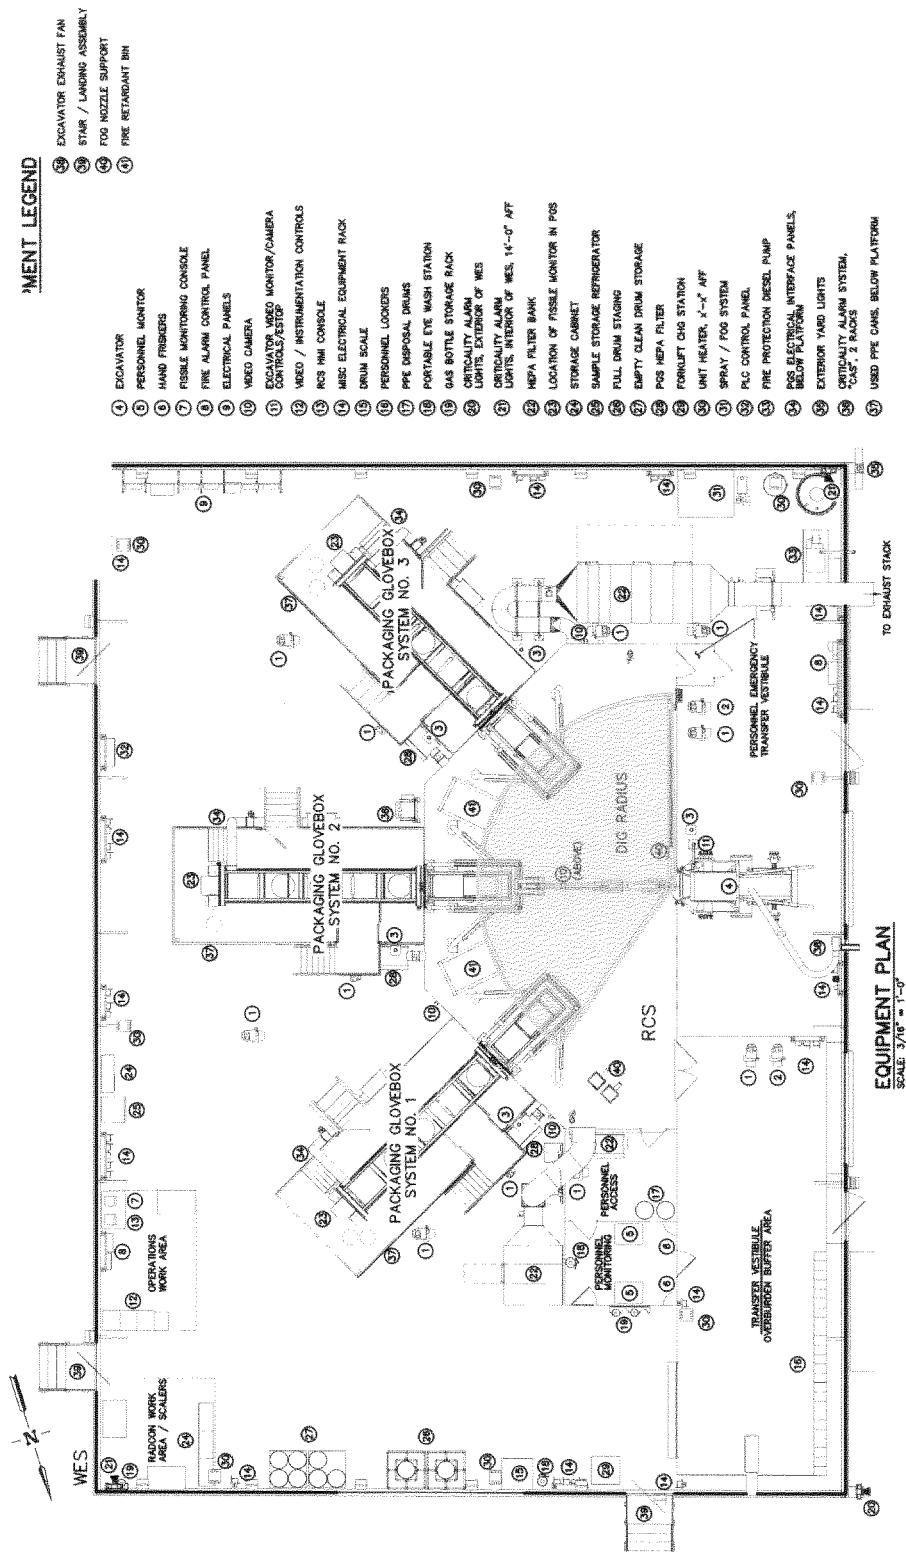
Simplified overview of the OU 7-10 Glovebox Excavator Method Project facilities.
